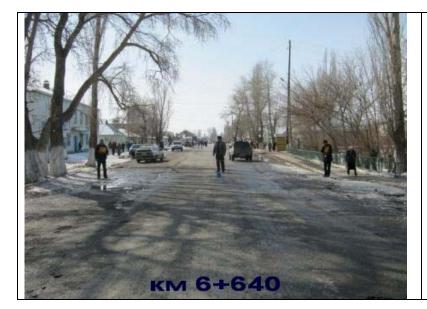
10 m road width is evidenced on the opposite side of the Rayon State Administration building
